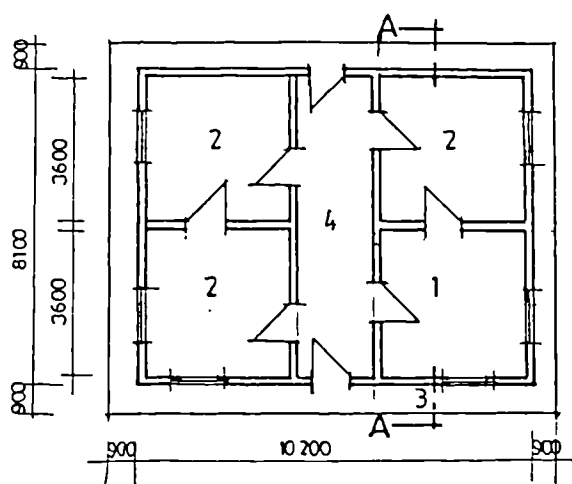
PLAN OF ROOMING ACCOMMODATION TYPE
